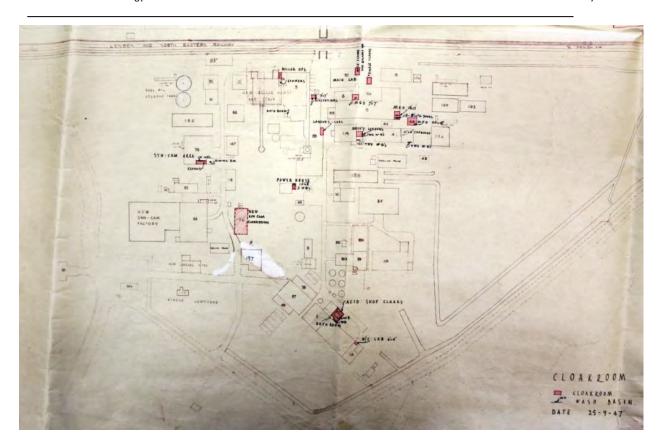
Detail from Plan of Cloakroom Accommodation, south of railway line, 1947 (SRO Ref. HC410/A7/7)
